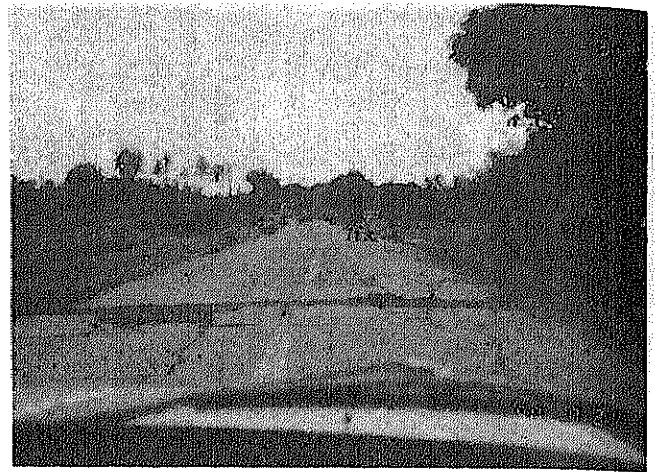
Depression of road from Calasiao - S. Barbara; Cross-cracking of pavement
